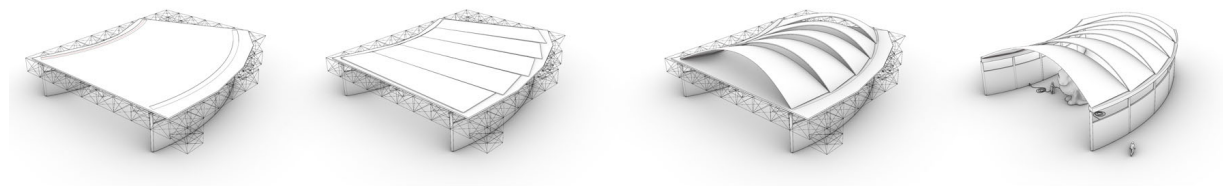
The entire process applied for a roof with a non-standard floor plan.
